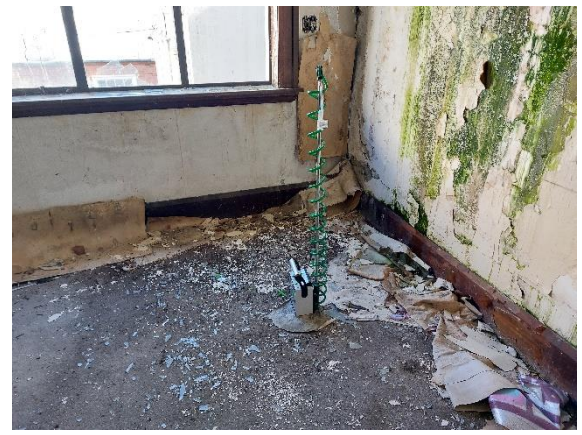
Spore Trap Sample A10 (L2 Room 31)
